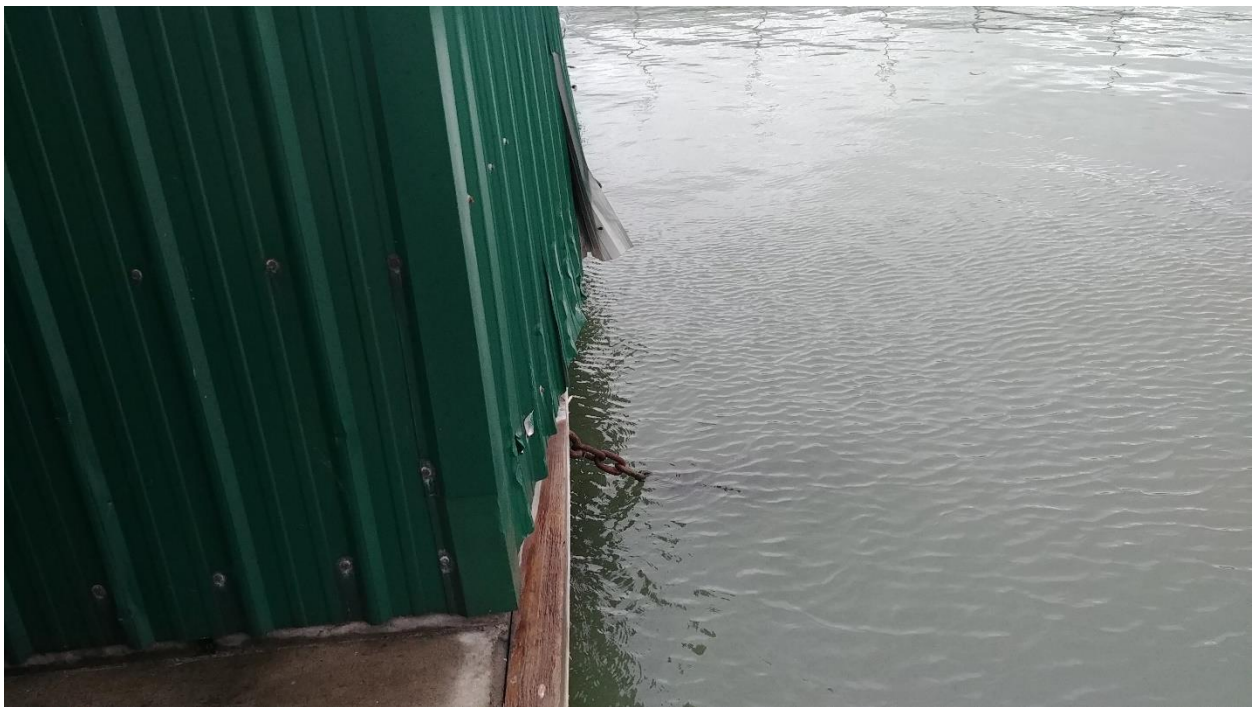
Metal Siding on West Face of Feed Barge is Not Attached, Peeling Away from Wall
